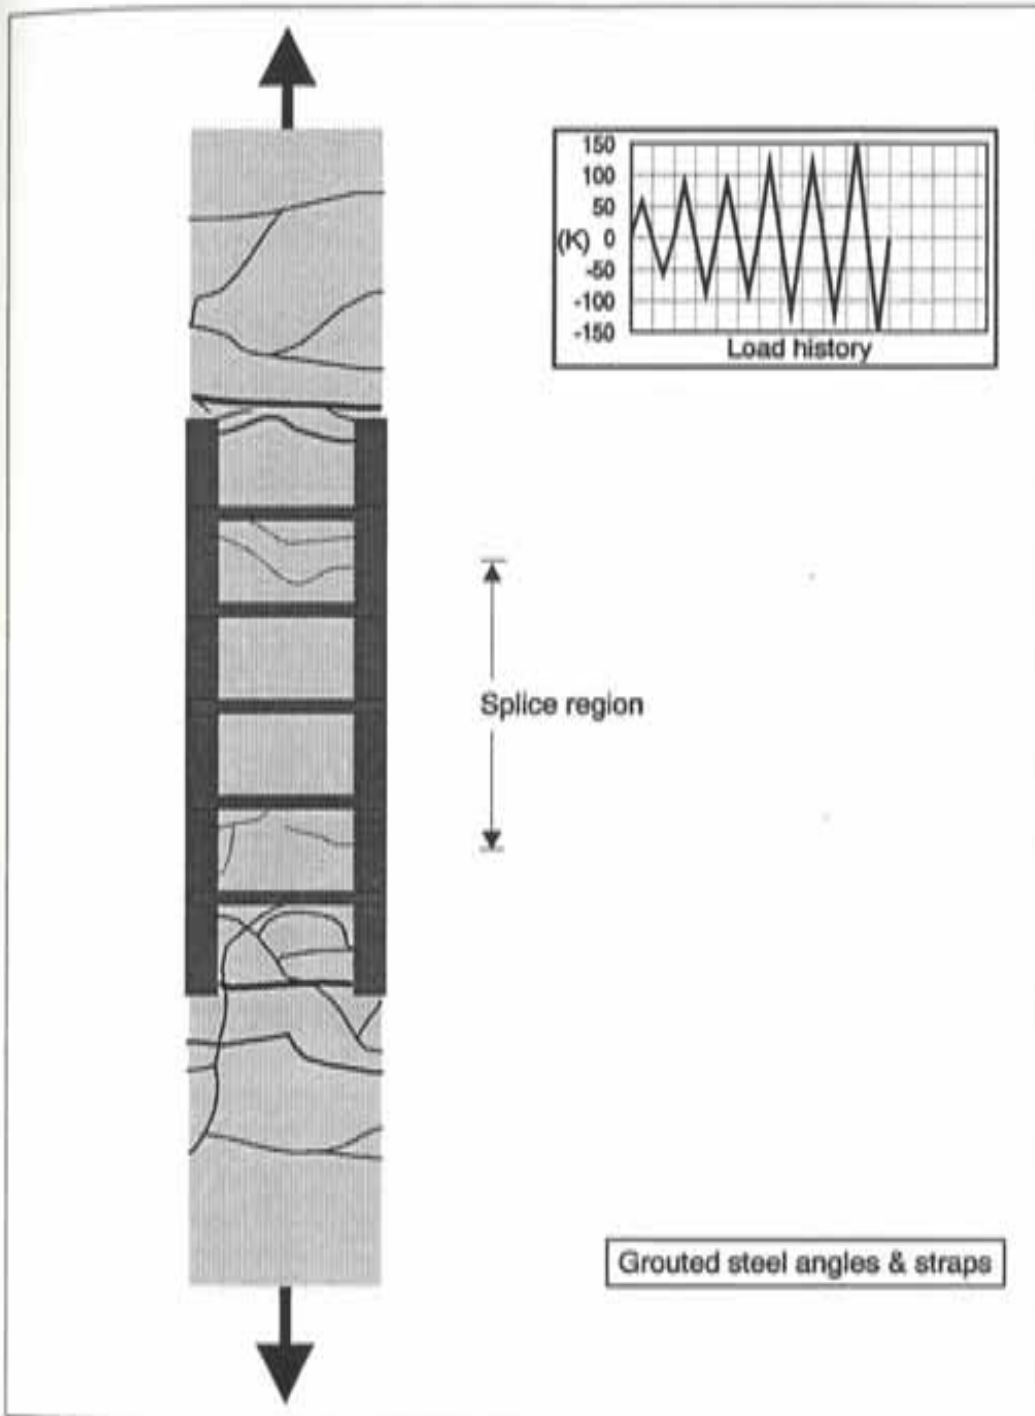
Crack pattern in specimen U-SS6-G-4
